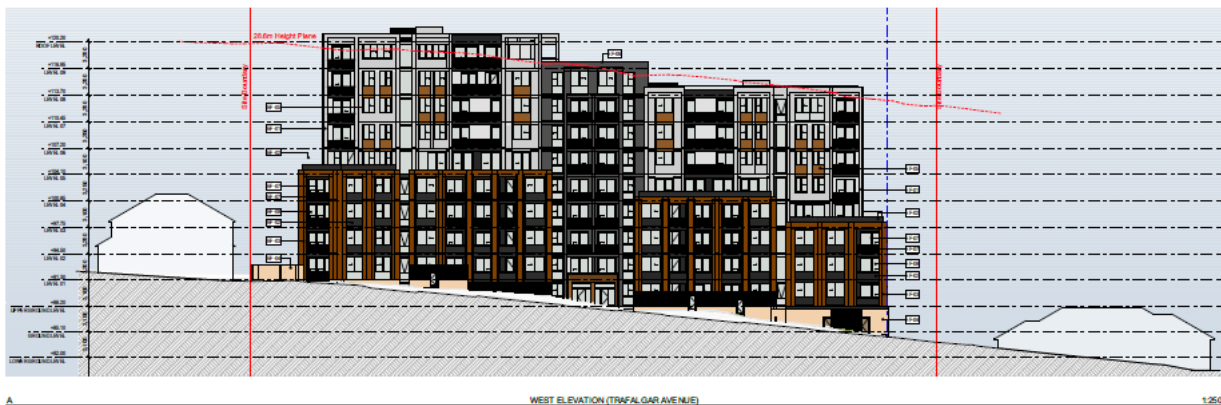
West Elevation - Trafalgar Avenue (DKO)
